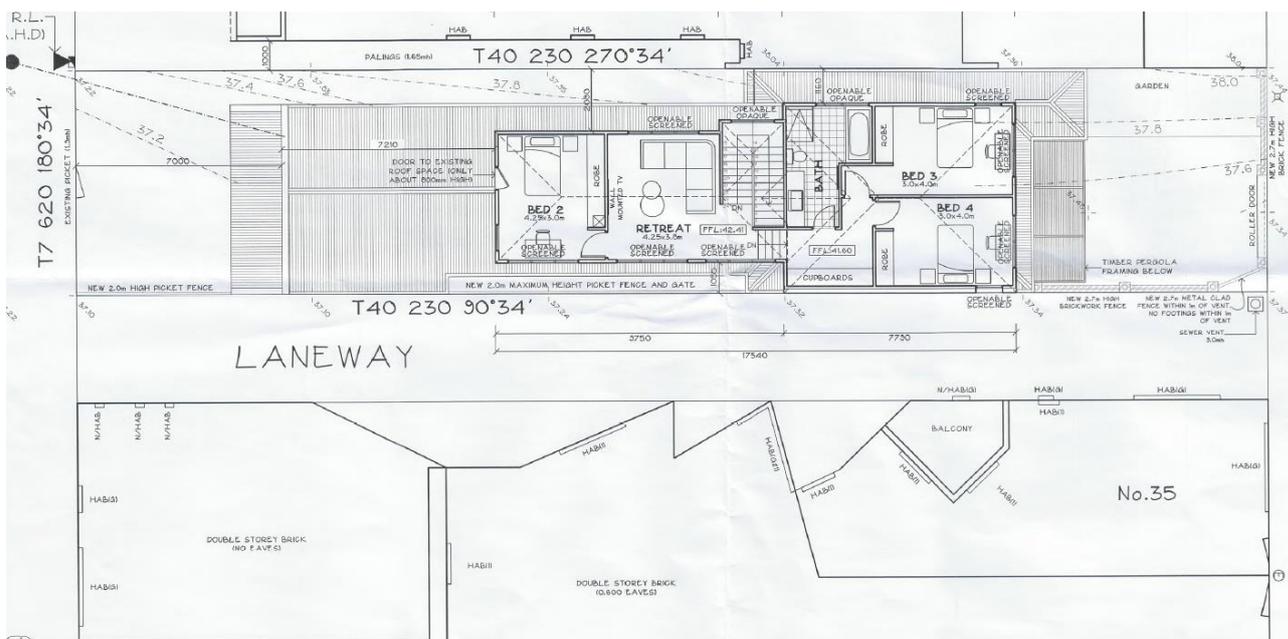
The first floor plan of 31 Berry Street as approved under planning permit PLN13/0803
